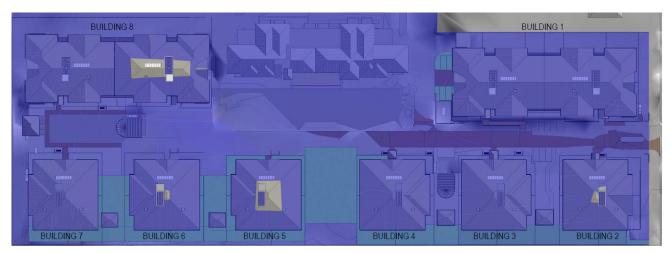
Proposed development plan overlayed with 12m height plane (blue) from the natural ground level Source: Allen Jack + Cottier
